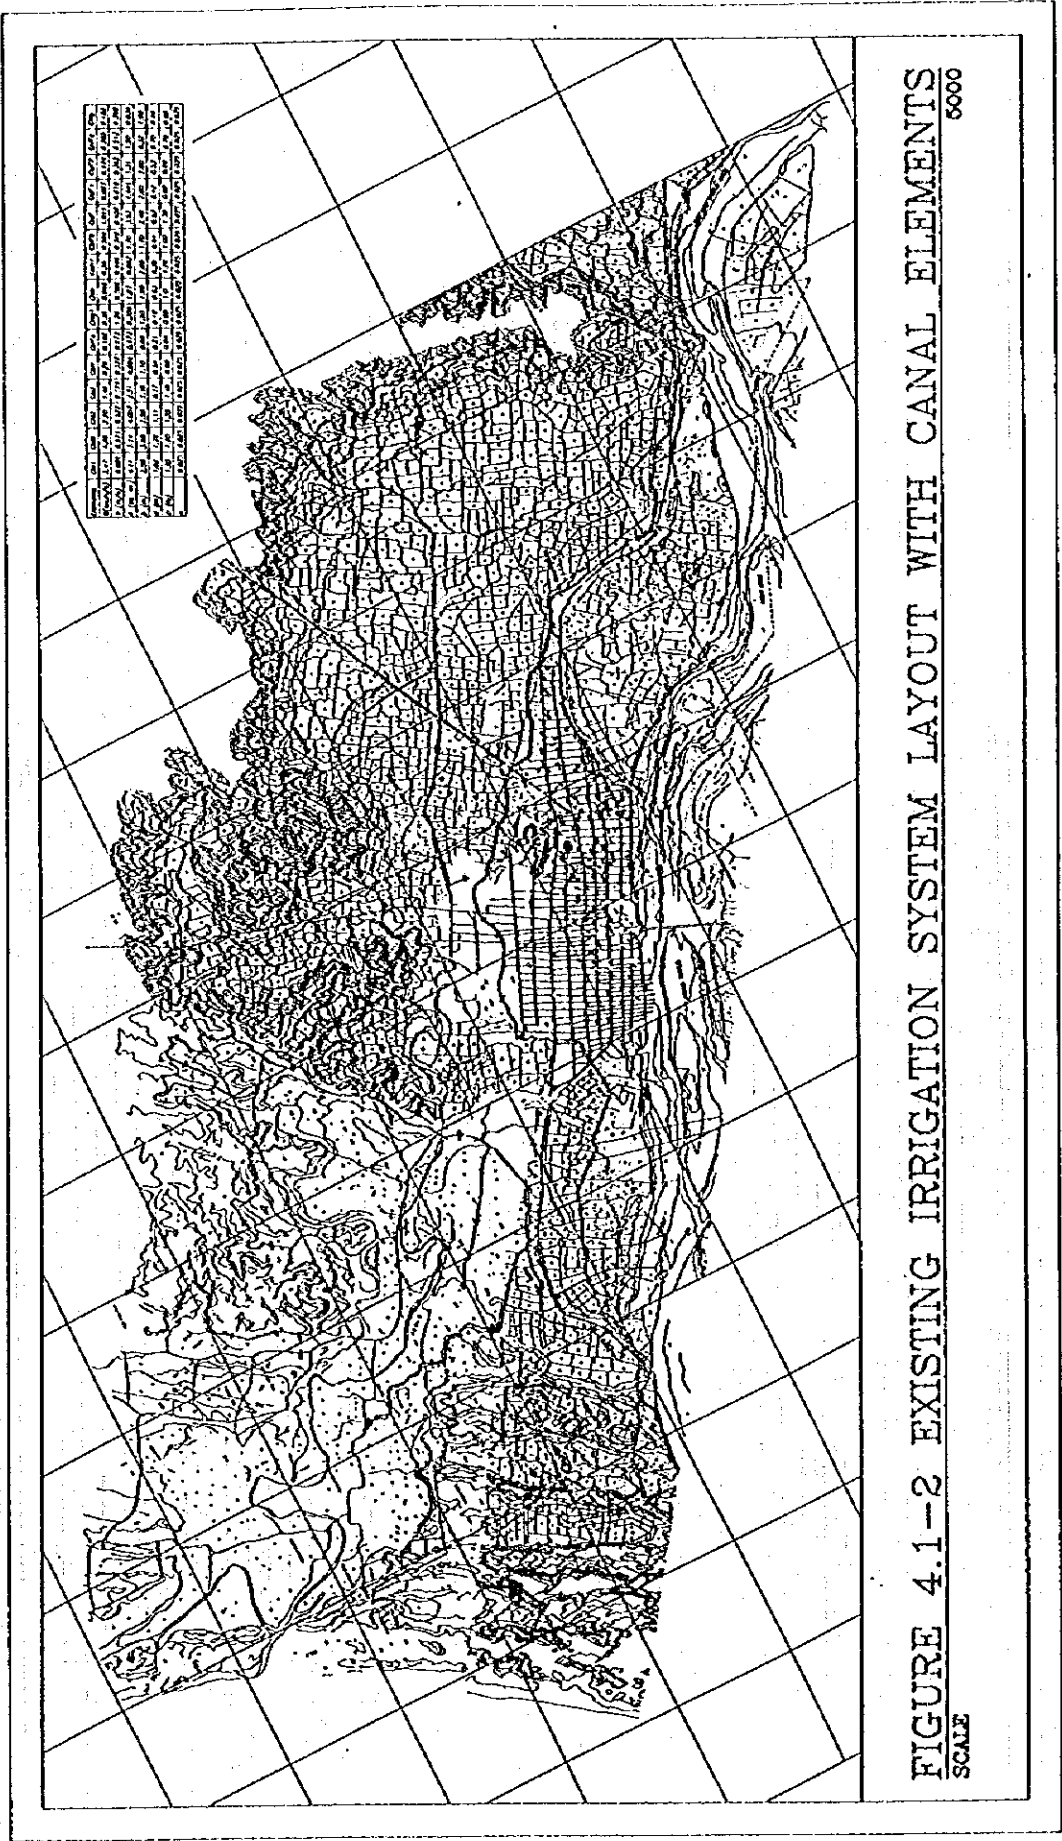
EXISTING IRRIGATION SYSTEM LAYOUT WITH CANAL ELEMENTS
